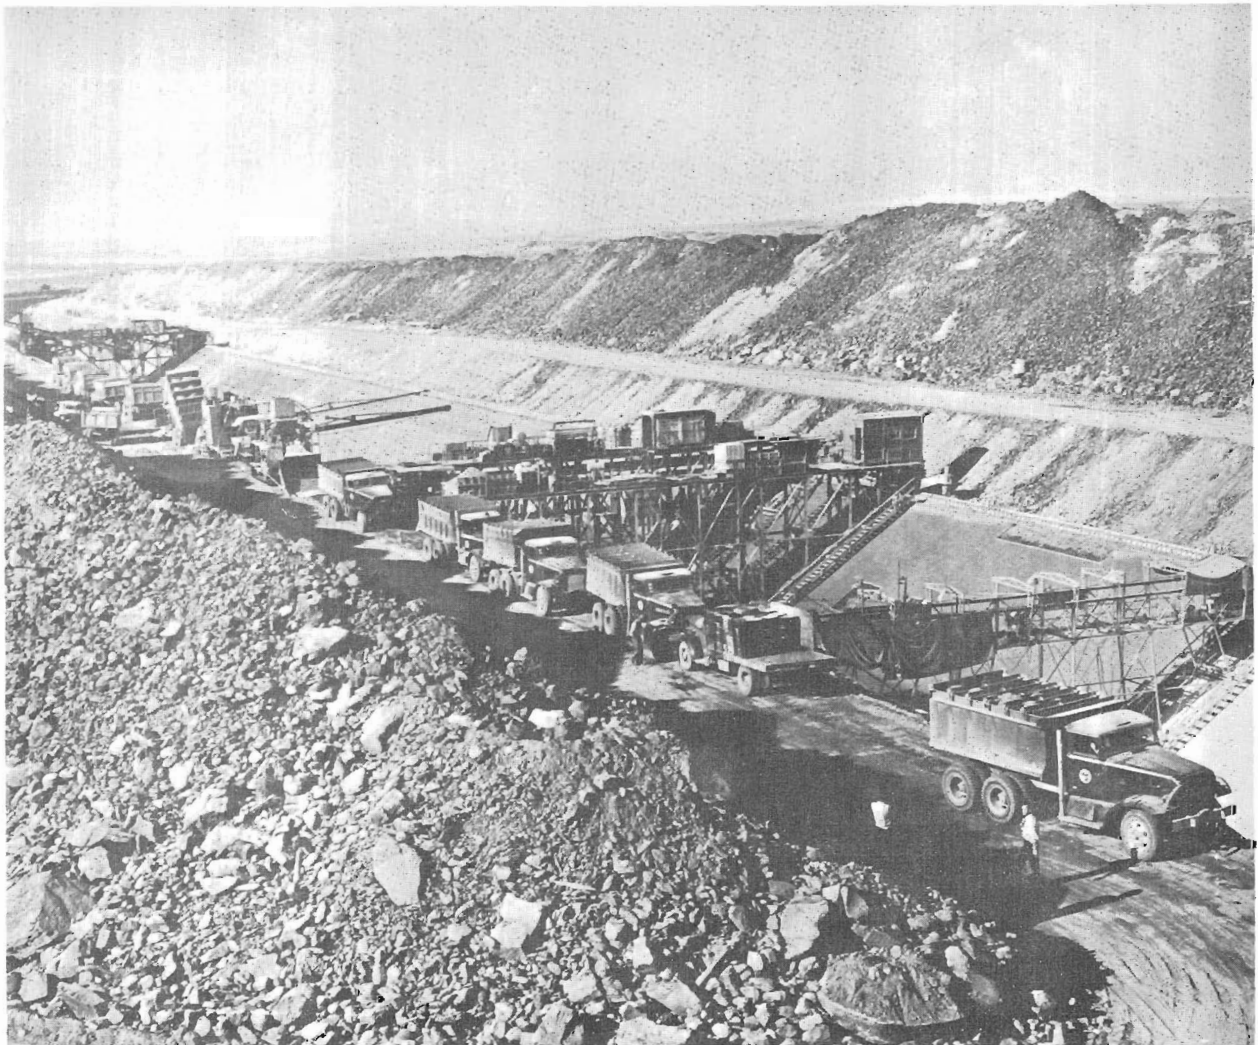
Concrete canal lining operations on East Low Canal, Columbia Basin project, Washington. Separate jumbos are used for trimming, lining, grooving, and applying sealing compound. Batch trucks and mixers operate on the berm of the canal. PX-D-32055.
